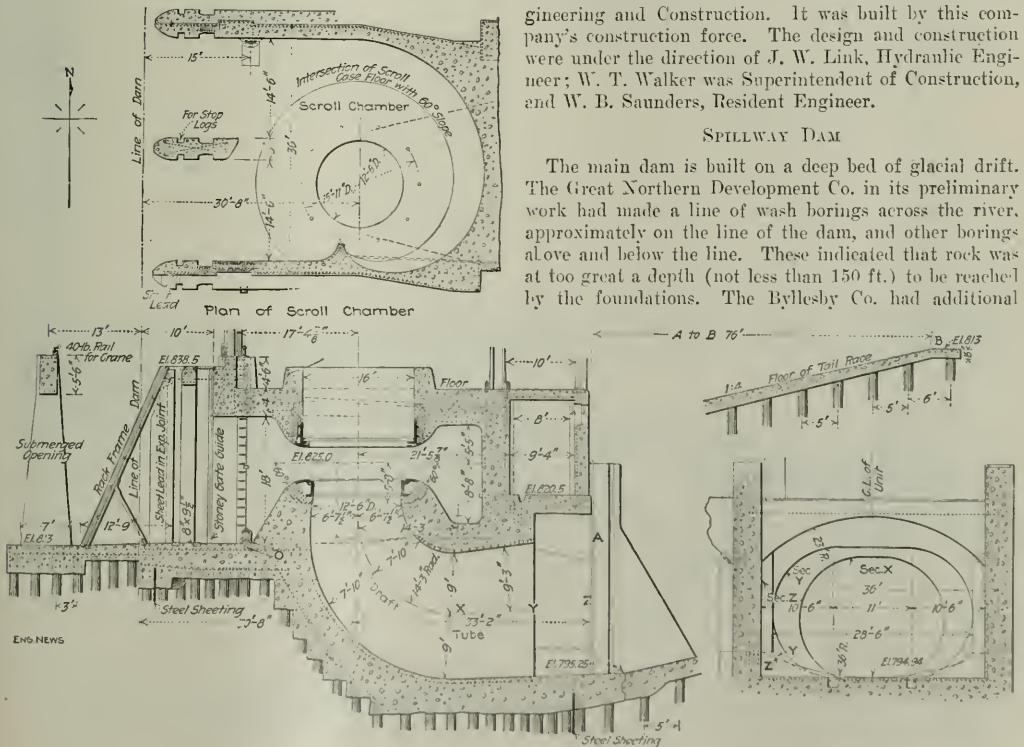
SECTION THROUGH LOWER PART OF POWER HOUSE: SHOWING THE INTAKE, SCROLL CHAMBER AND DRAFT TUBE OF ONE UNIT
